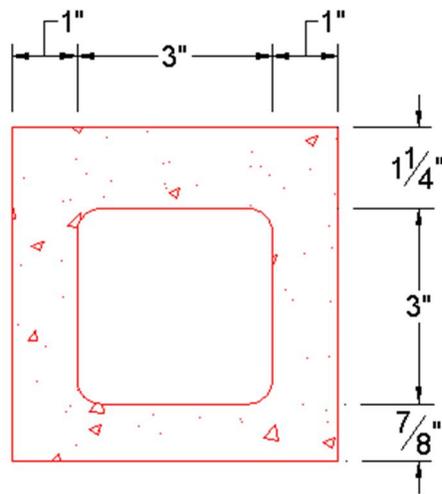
Reduced Cross Section Used for Compressive Strength Testing
